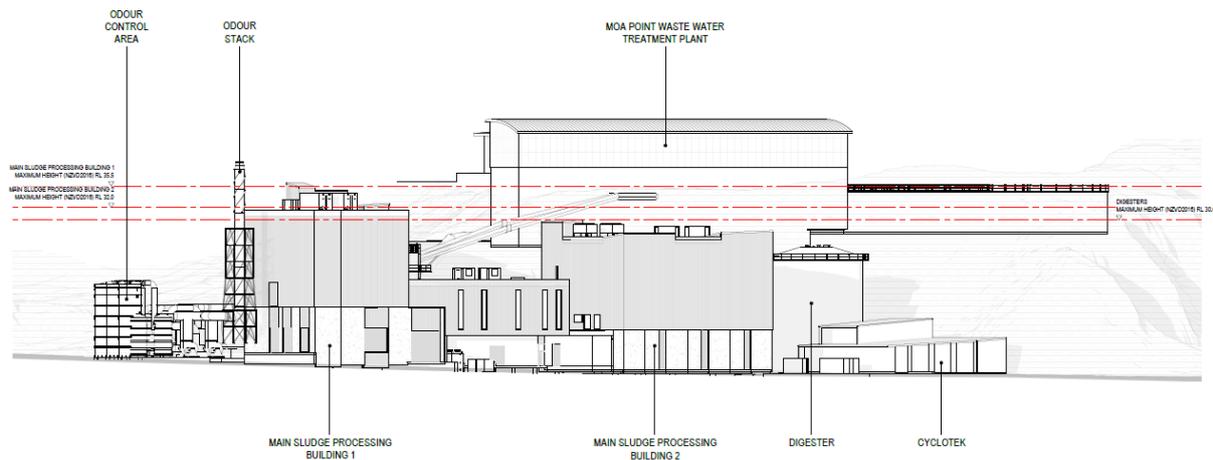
The buildings screening the quarry face (subject of shotcrete)
